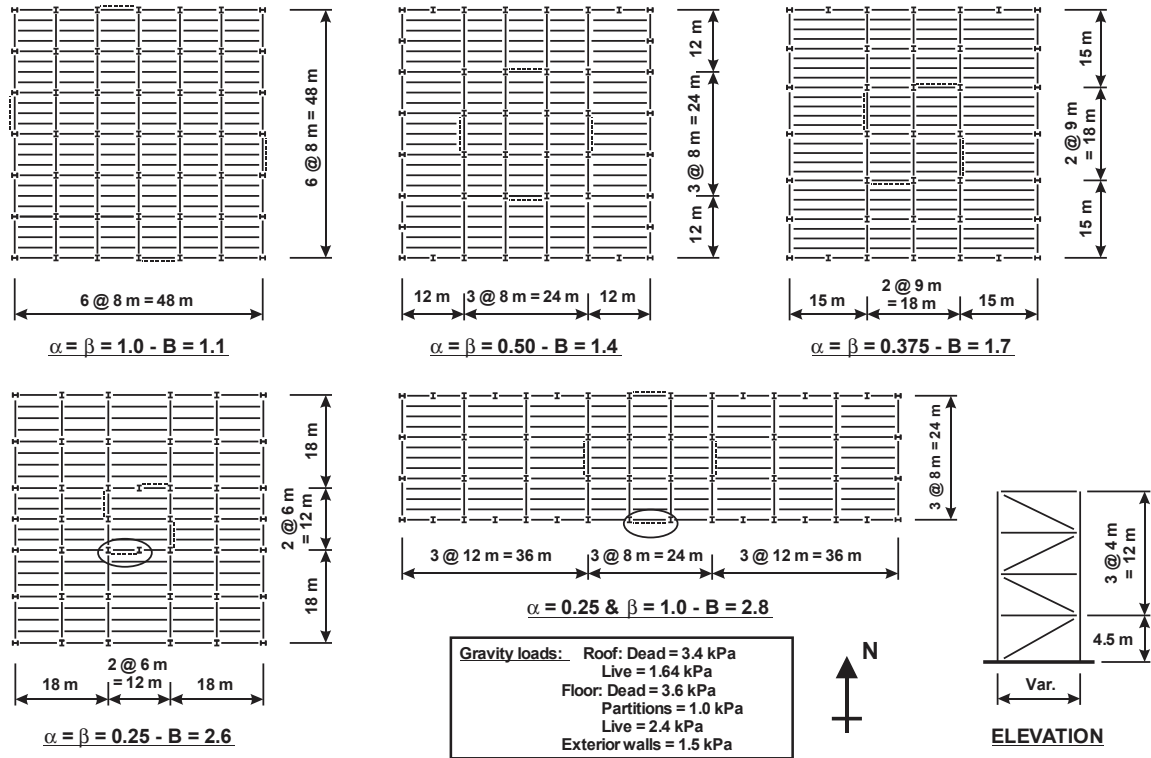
Geometry and design gravity loads of the buildings (CM and CR located at the geometric center of the buildings).
